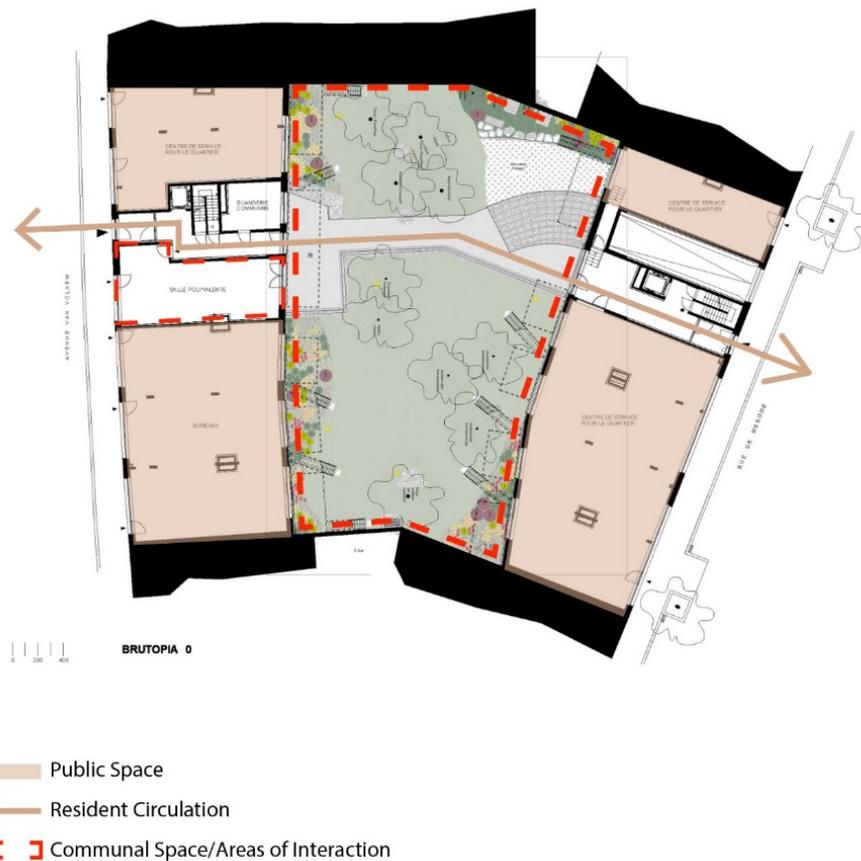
Brutopia Ground Floor Plan (Source: ArchDaily & Author)
